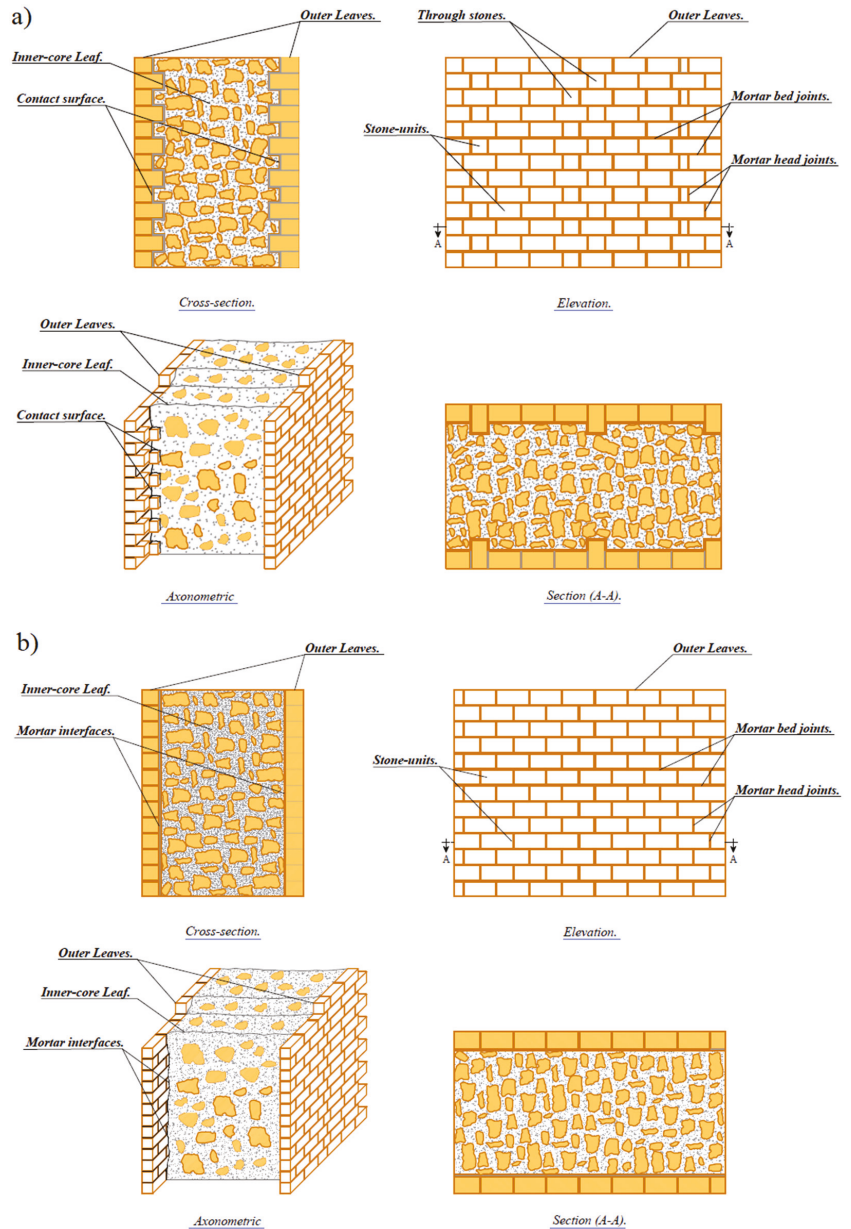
Common topologies of the transversal section of multiple-leaf stone-masonry walls in historic mediaeval masonry constructions in Egypt (a) with keyed and (b) straight collar joints.
